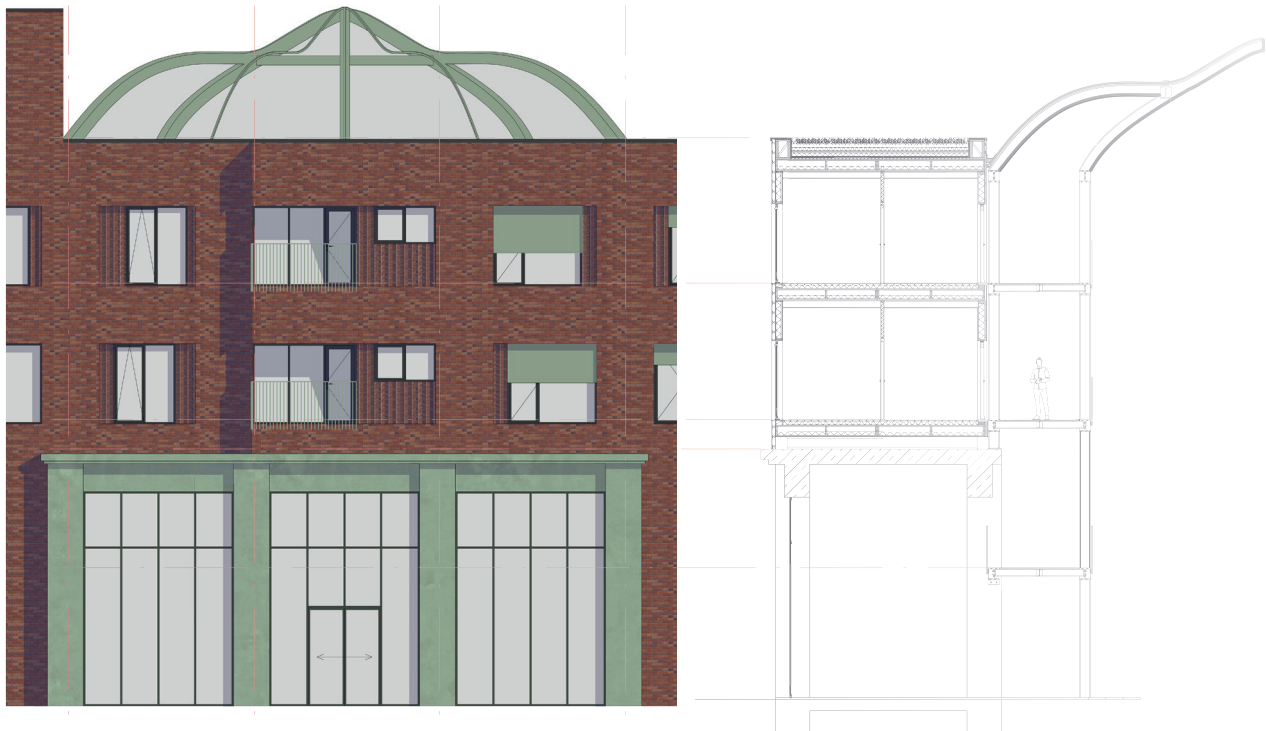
Elevation Inside East Facade (NTS: adapted from 1:100 original)
